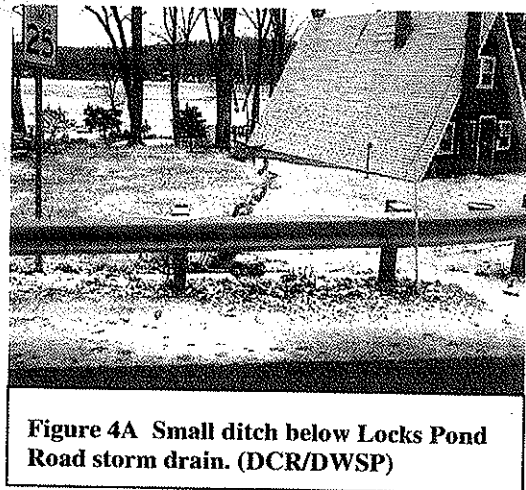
A Small ditch below Locks Pond Road storm drain. (DCR/DWSP)
